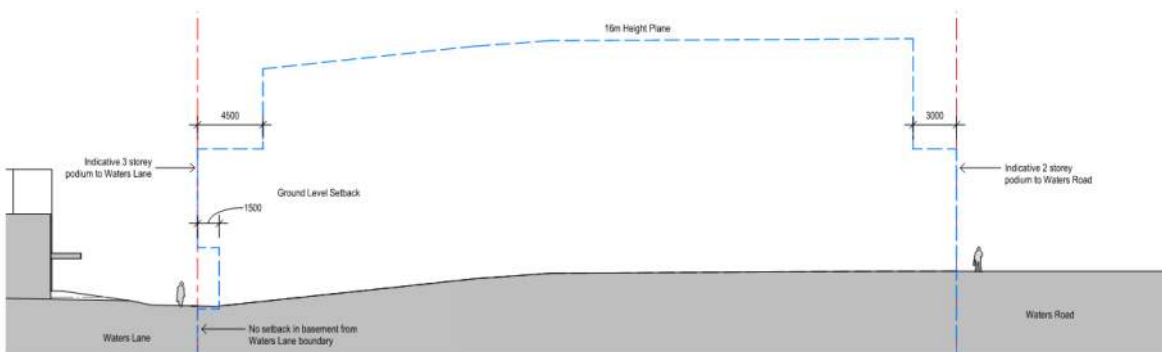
Permitted Building Envelope illustrated in section (source: SJB Architects)
